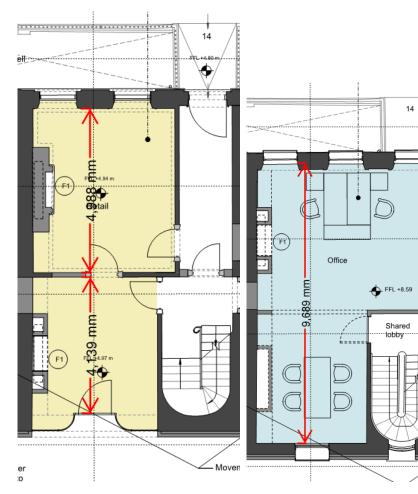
Typical Retail and Office floor plate in Keats House for Units 14.
